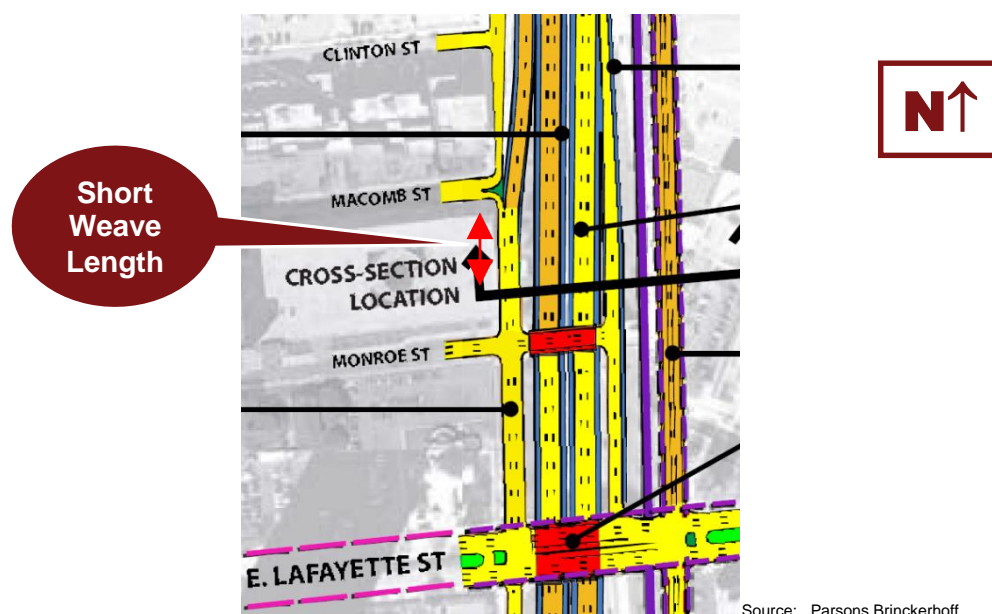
SB I-375 off Ramp Weave at Lafayette St
